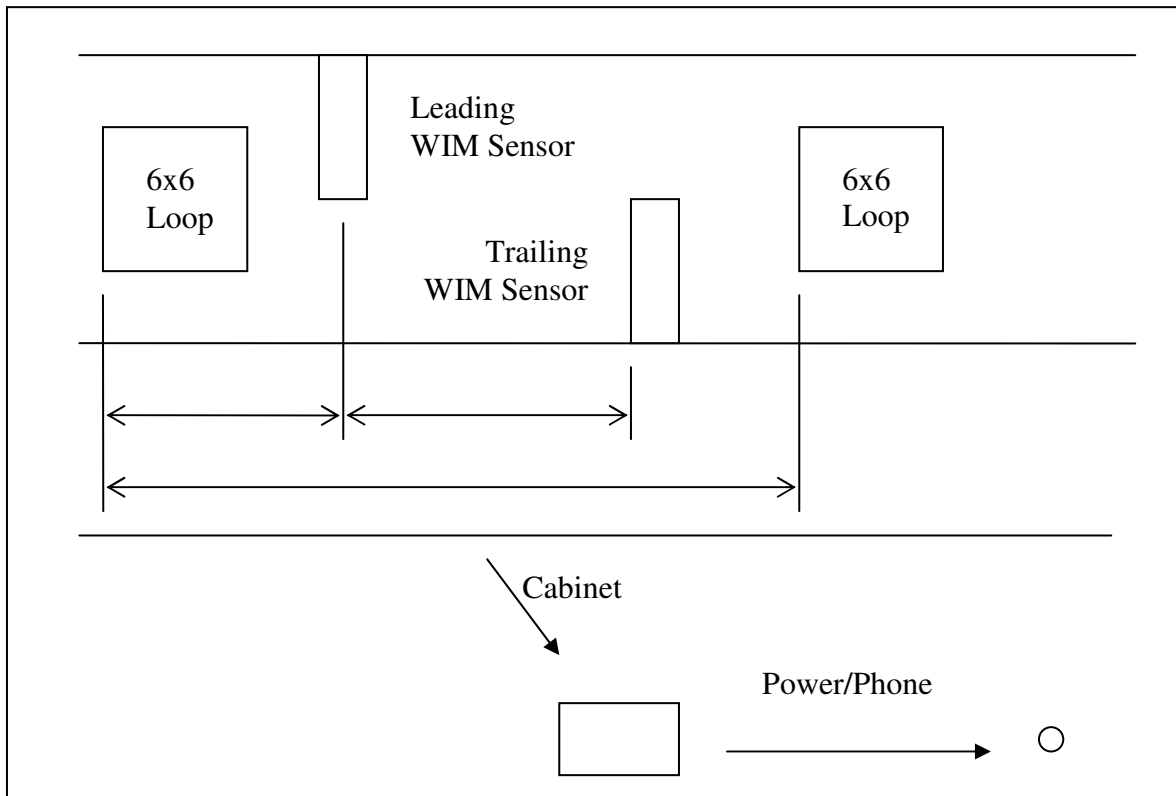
Site Equipment Layout for 510100 in Virginia
